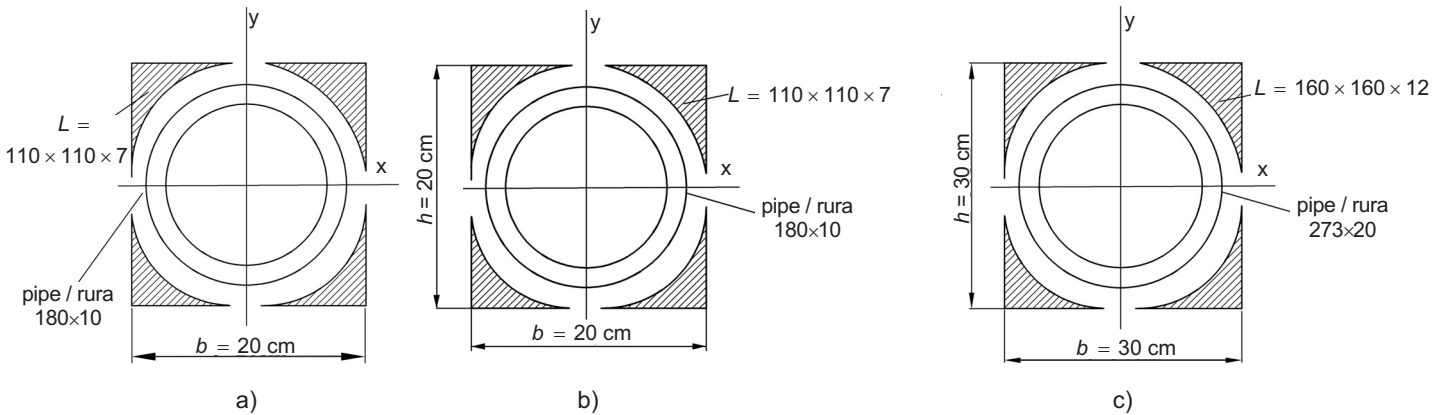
The cross sections of elements of the space frame: a) vertical posts, b) longitudinal bars, c) cross bars
